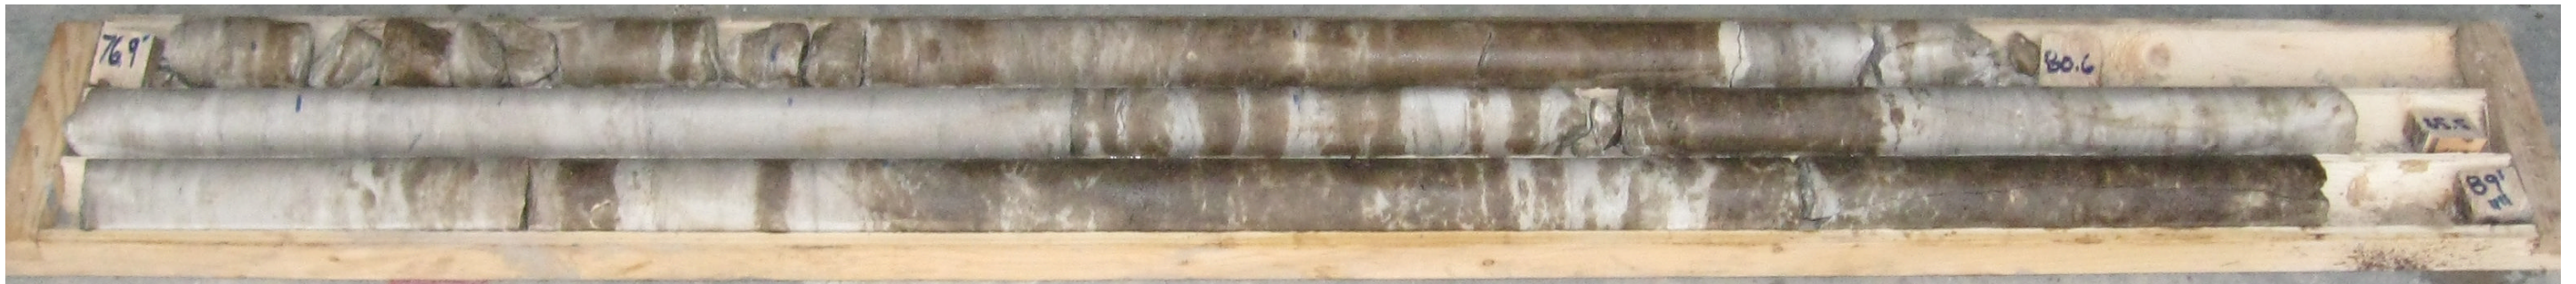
BH-343 – Rock Core Boxes 1 and 2. Elevation 155.70 metres to 150.75 metres
